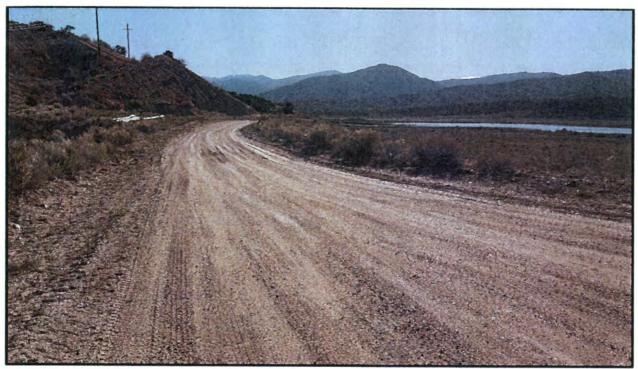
North end of dam at right abutment, looking east along the access road. Note water pool location within normal limits.
